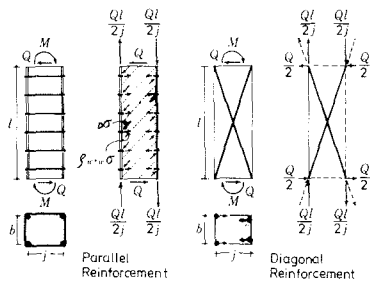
Principal Shear Resistance Mechanism of Diagonally Reinforced Members
